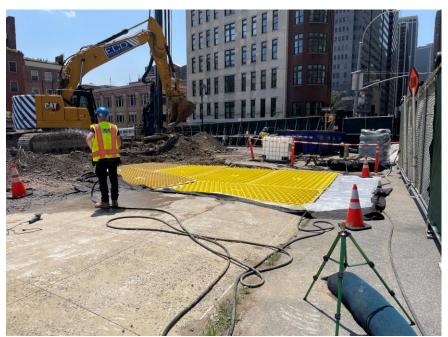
Stabilized construction entrance in the northwestern part of the site (facing west)
